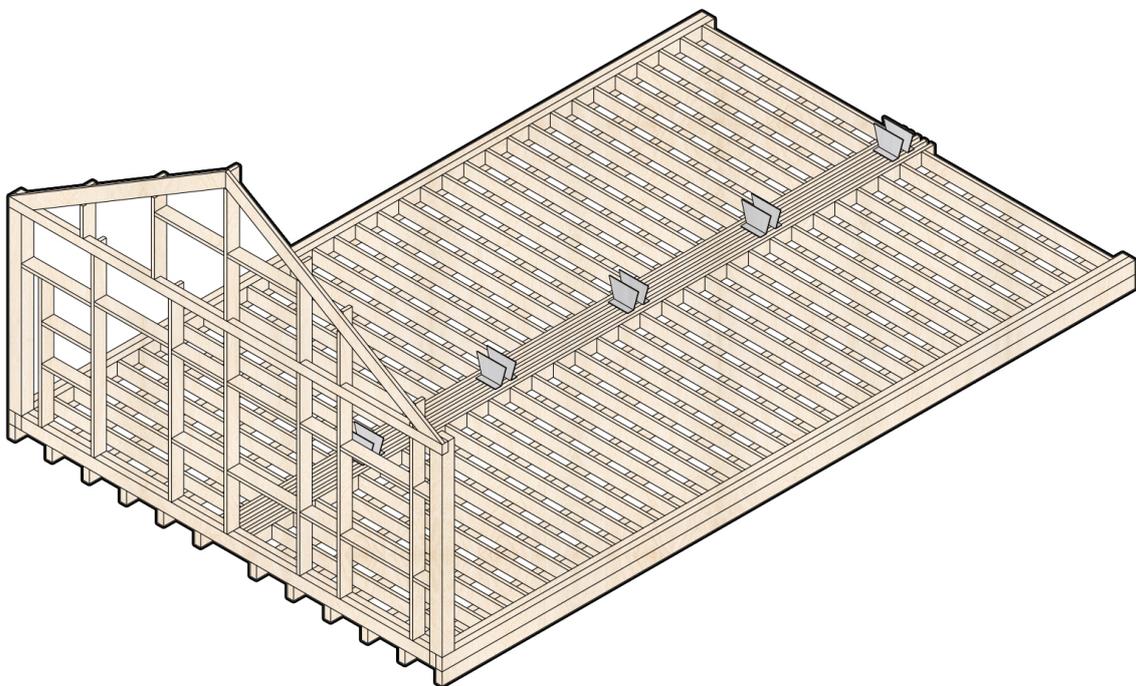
Construction stage 3 placing the frame of entrance to the position. Original author
